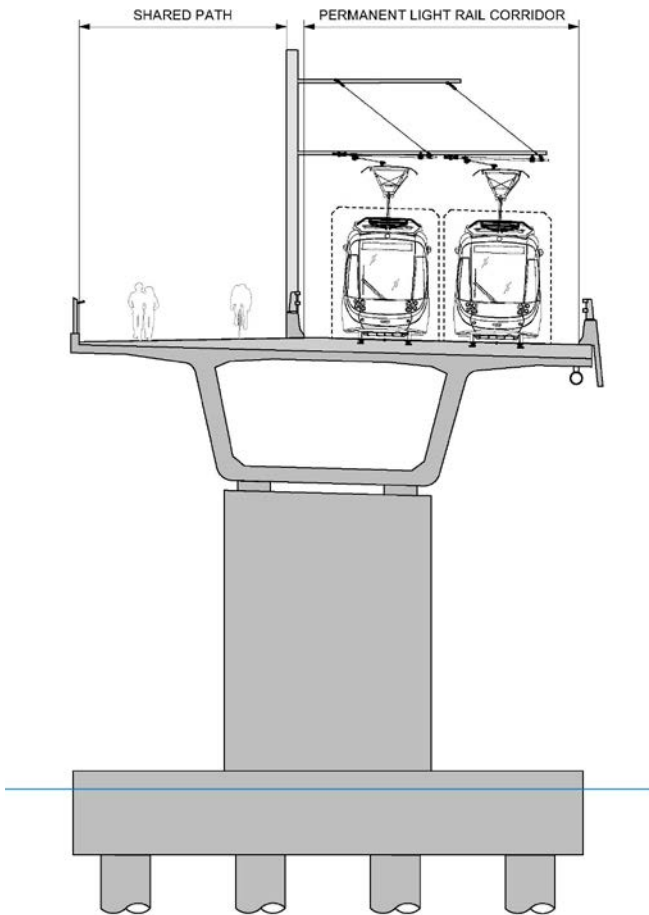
Typical cross section - New bridge between Melrose Park and Wentworth Point at bridge pier (indicative only - subject to design development).
